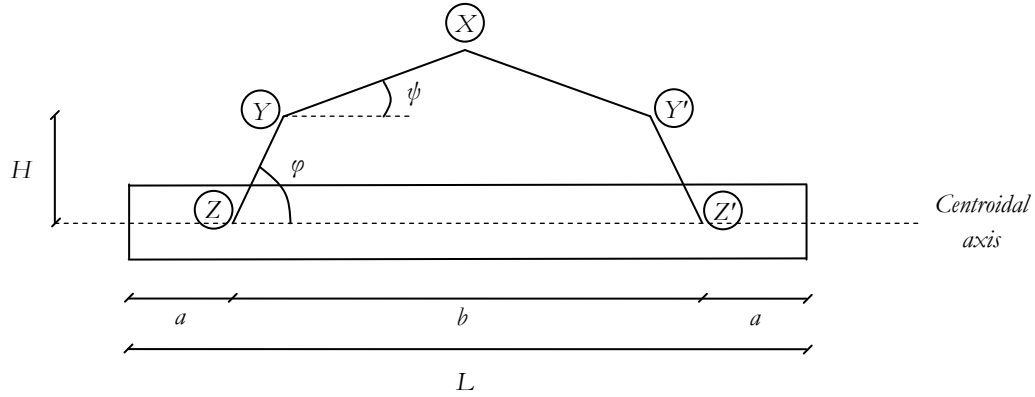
27 Undeformed geometry of a beam hanging from inclined yokes and cables. ^[19]
